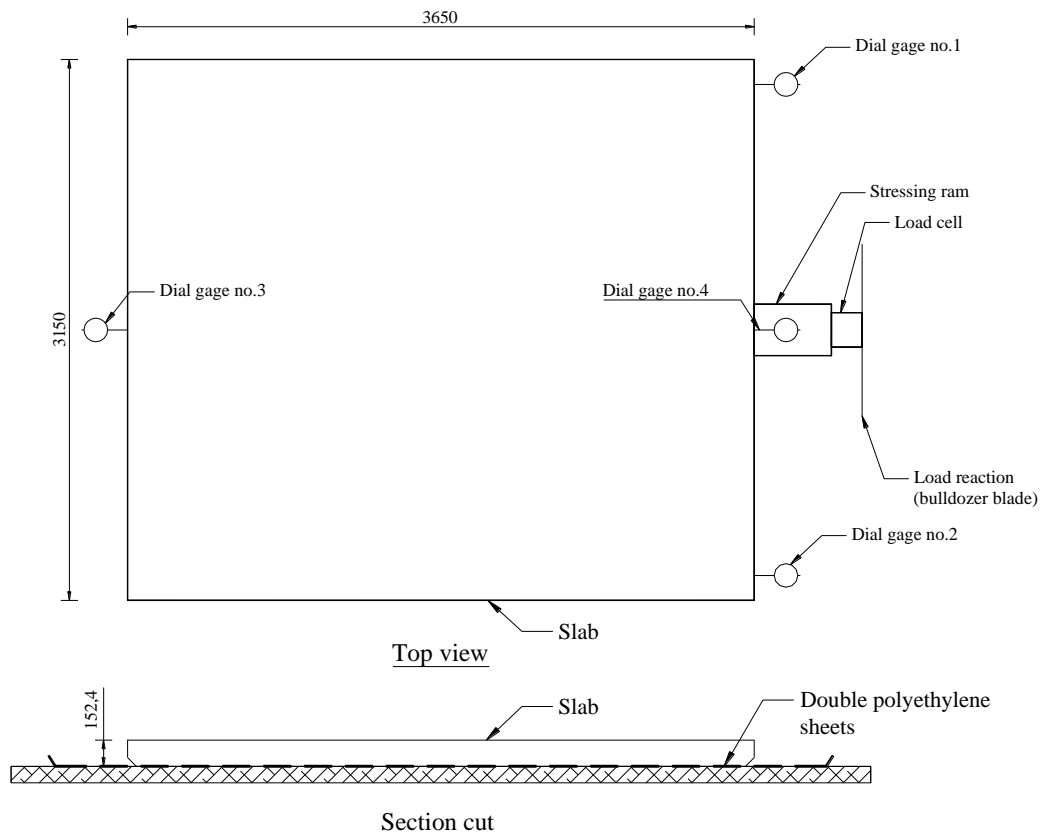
Test setup of slab tested in [201] (dimensions in mm).
